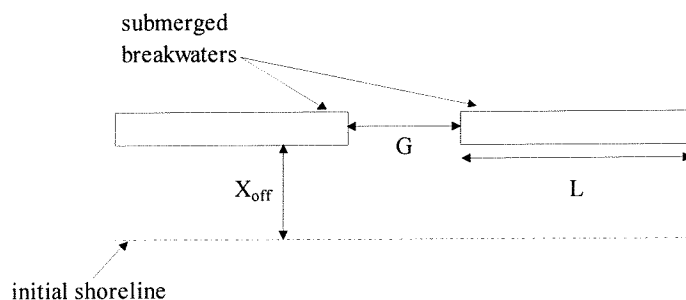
Definition sketch of a plane arrangement of submerged breakwaters
